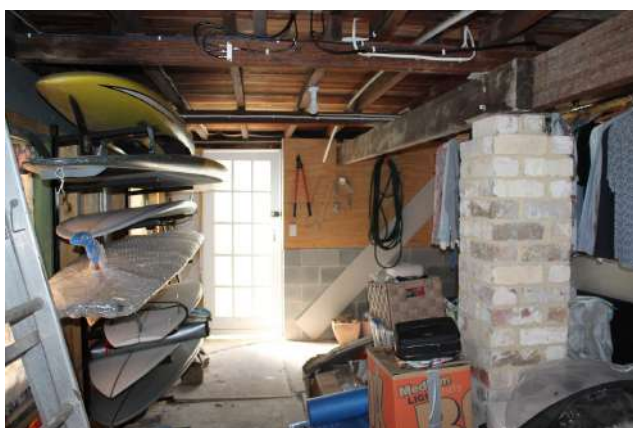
1168 Barrenjoey Road, Palm Beach
